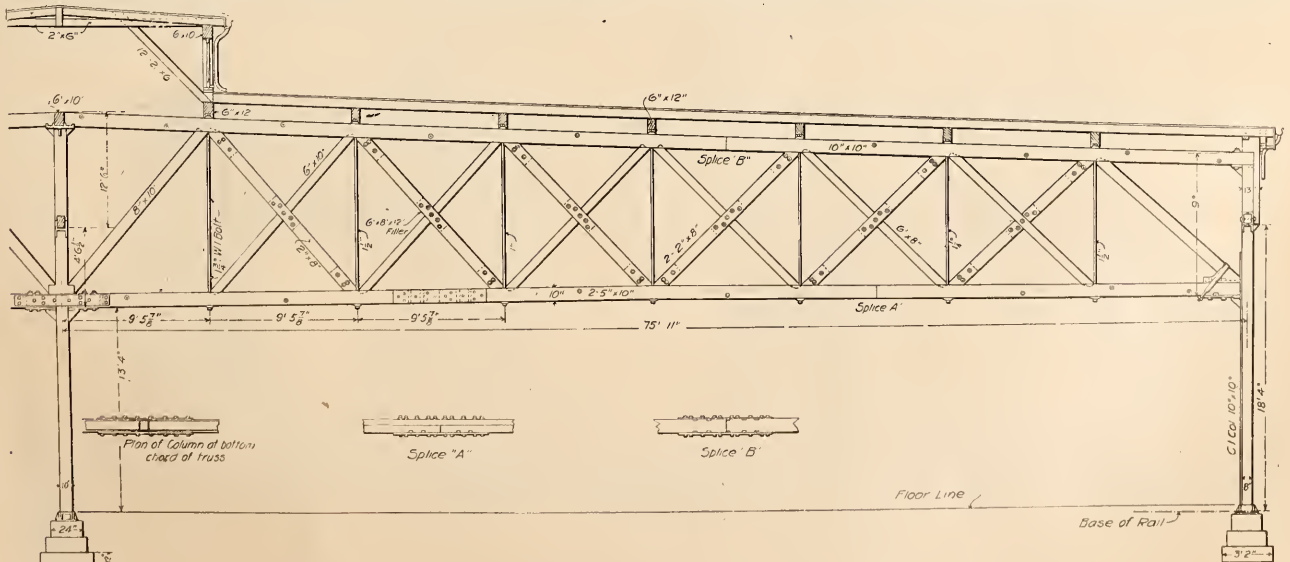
SHOWING CONSTRUCTION OF ROOF TRUSSES—T. R. R. ASCN. OF ST. L.
